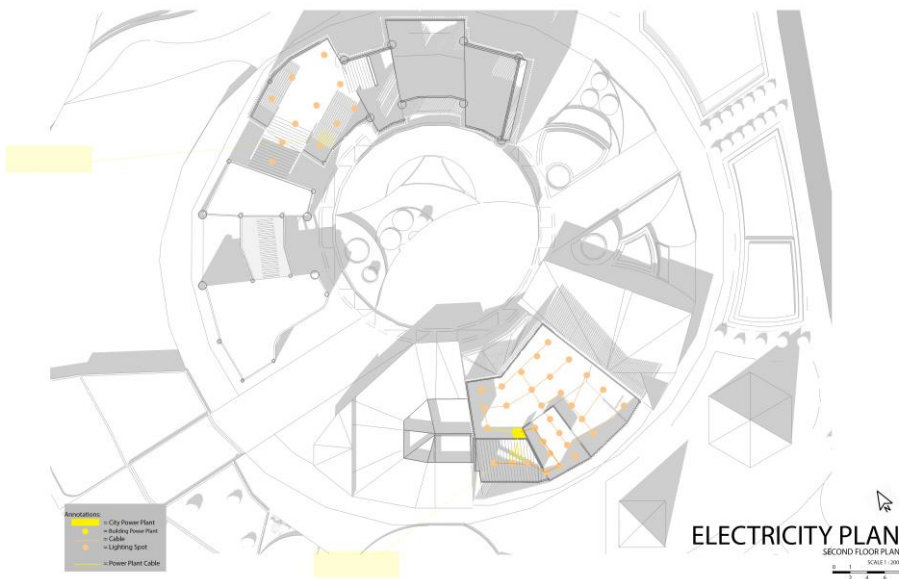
Electricity Second Floor Plan (Source: author analysis)
